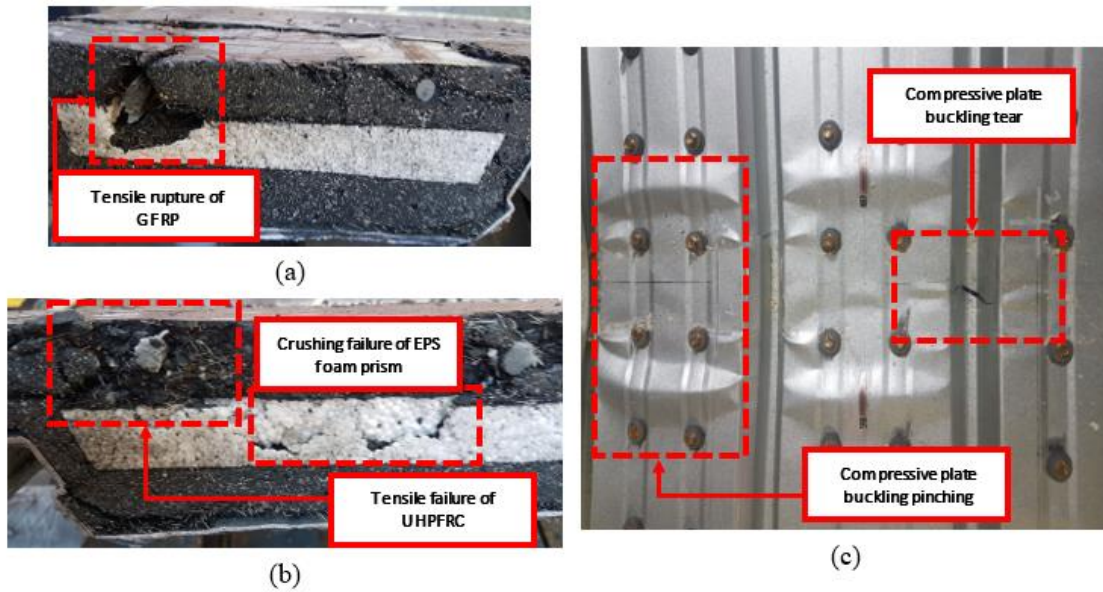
Failure modes of specimen B1-2: a) Tensile rupture of the longitudinal GFRP reinforcement; b) Tensile cracking of UHPFRC and crushing failure of the EPS foam prism; and c) Compressive plate buckling/pinching and tearing of plate due to buckling within fluted region.
